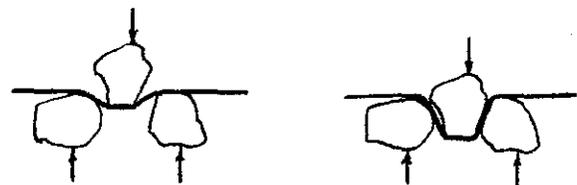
Mode of failure (a) before bond failure, (b) after bond failure
